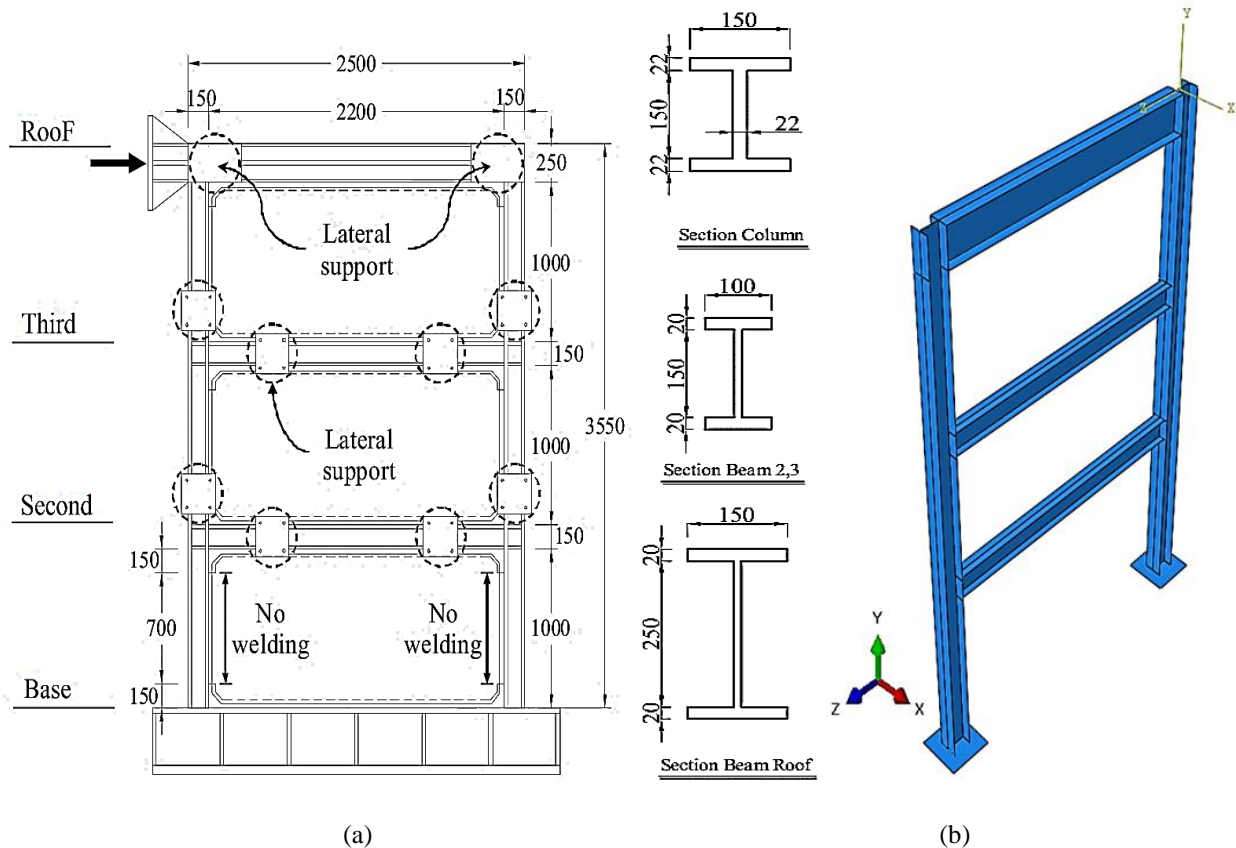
Dimensions of the steel frame (unit: mm): a) The tested specimen (Choi and Park; 2008); b) The FE model
